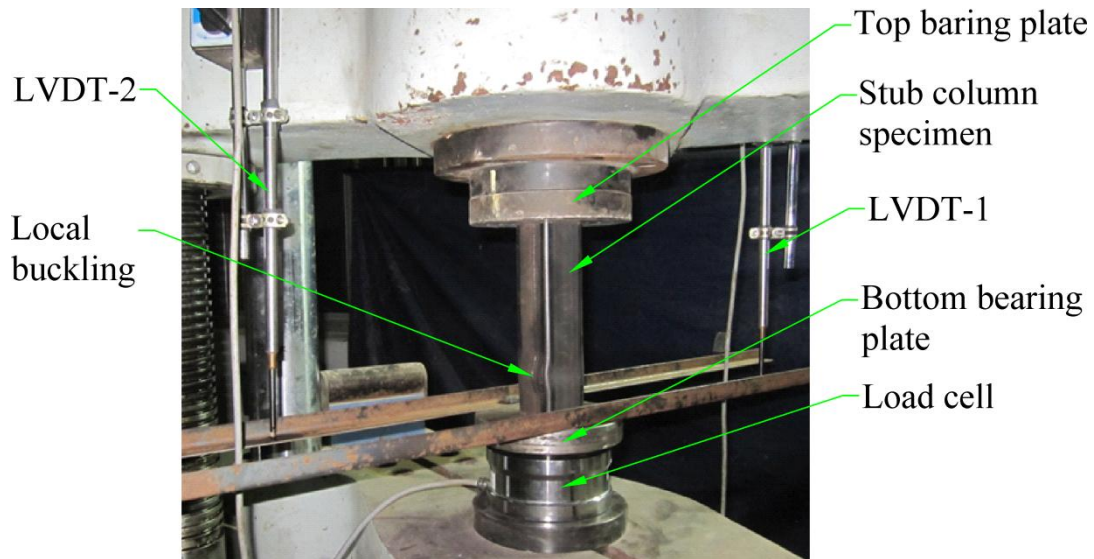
Stub columns compression test setup for 1000 kN load UTM
